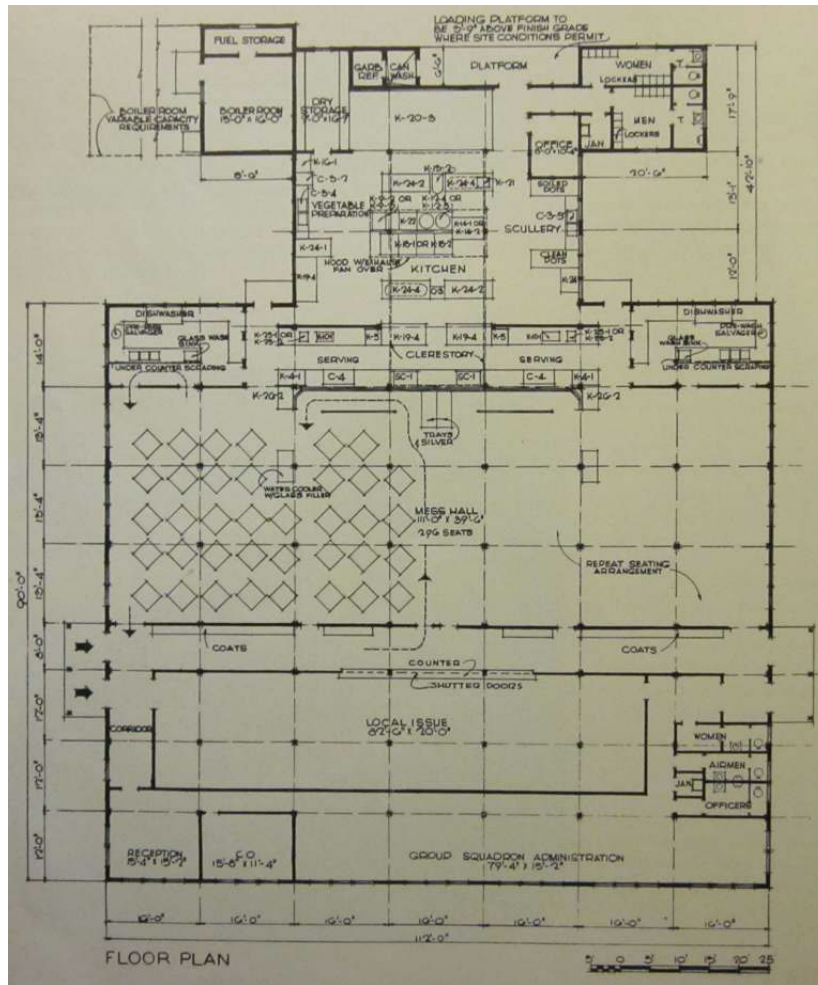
TYPICAL MESS HALL LAYOUT (ARCHITECTURAL RECORD 1952 :120).
